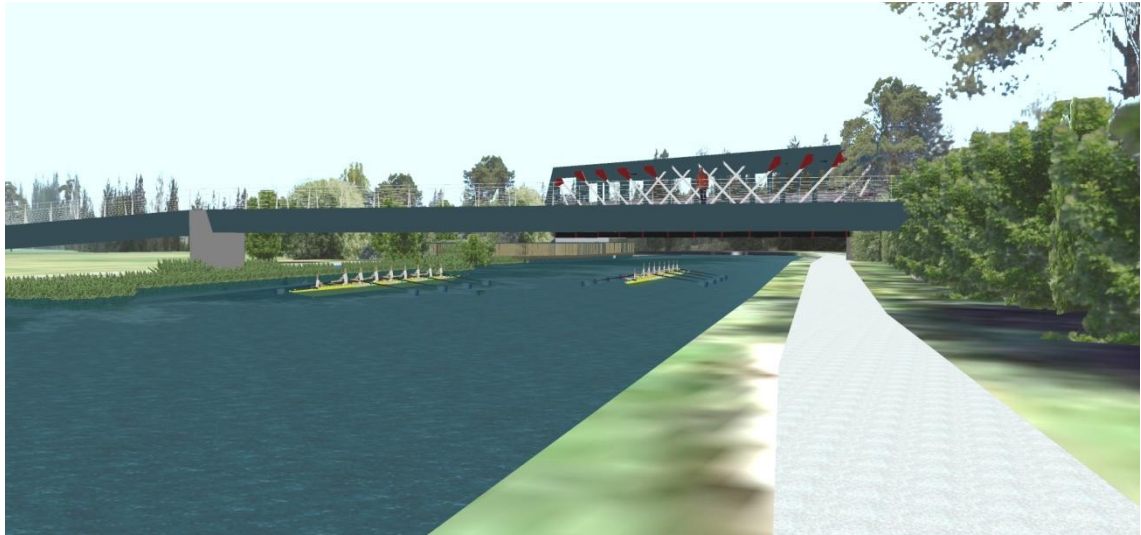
Computer illustration of the proposed foot/cycle bridge main span in box-girder form with the existing railway bridge in the background
